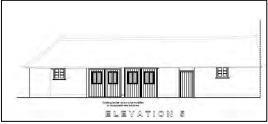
Proposed Northern Elevation of the Converted Barn Building.
